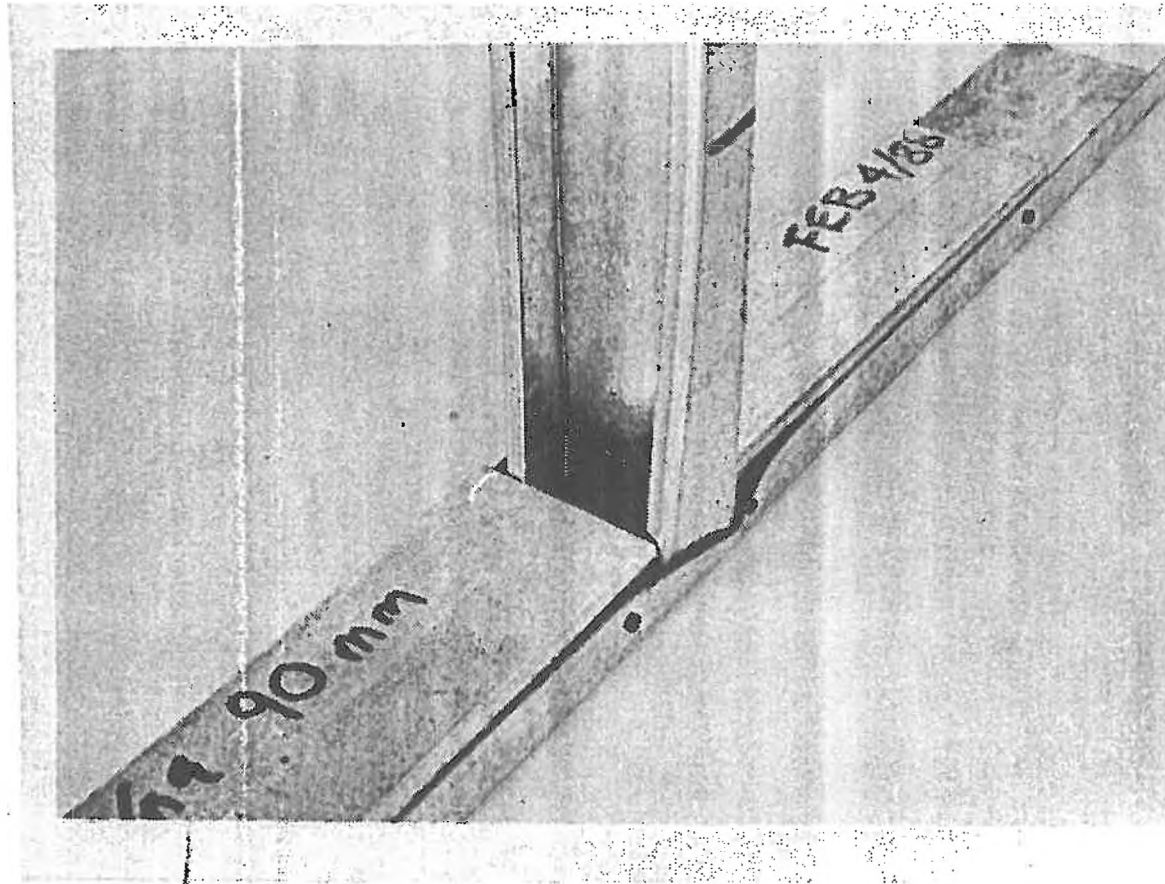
Photograph of Box Track Connection Specimen After Failure - Series D9
